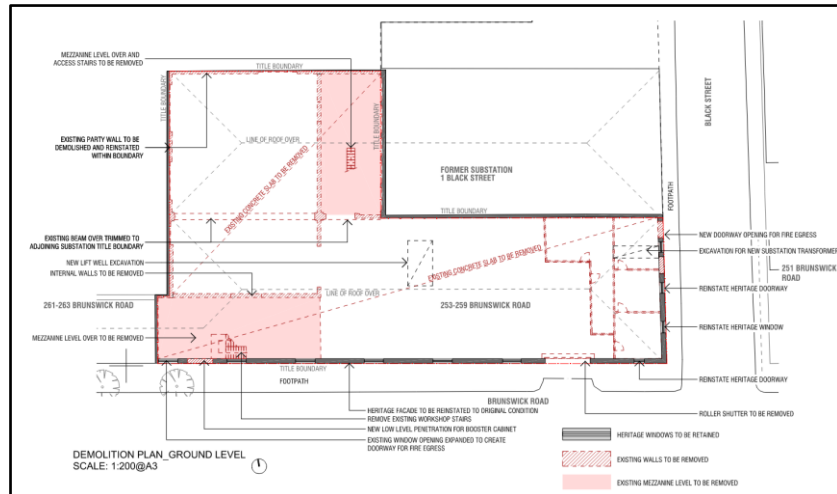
Proposed demolition plan at ground level - extract from 2732_Brunswick Road_Town Planning Package
